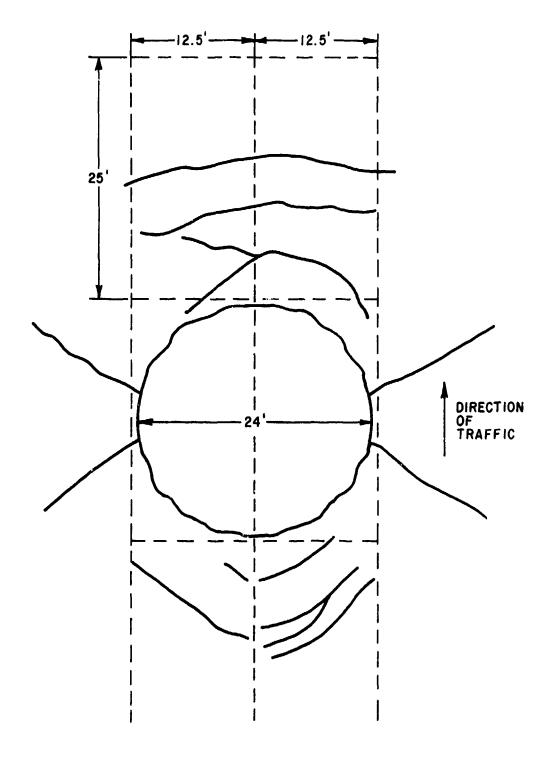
Cracking Pattern in Runway Slabs Surrounding Crater 1
